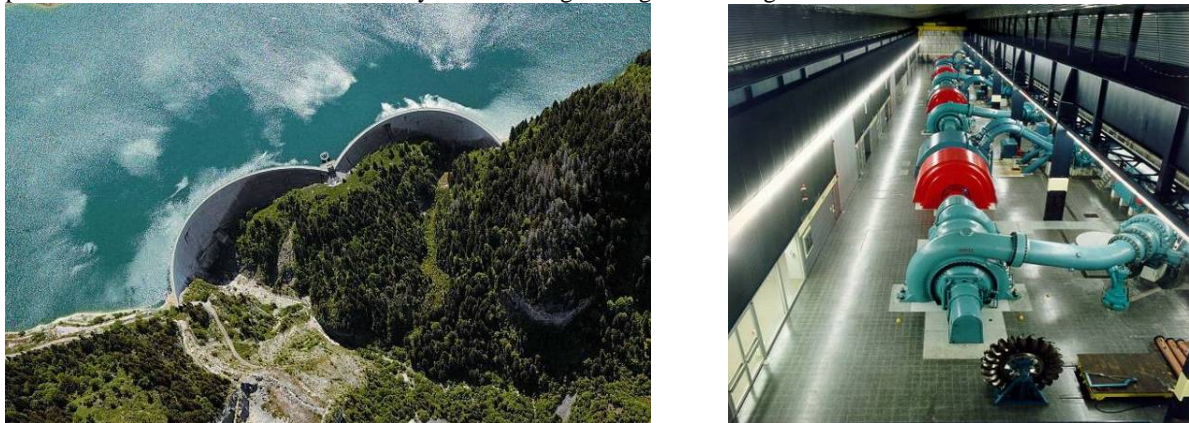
Hongrin Reservoir with the twin arch dam (left) and view of the existing 140 m long Veytaux 1 powerhouse (right)
